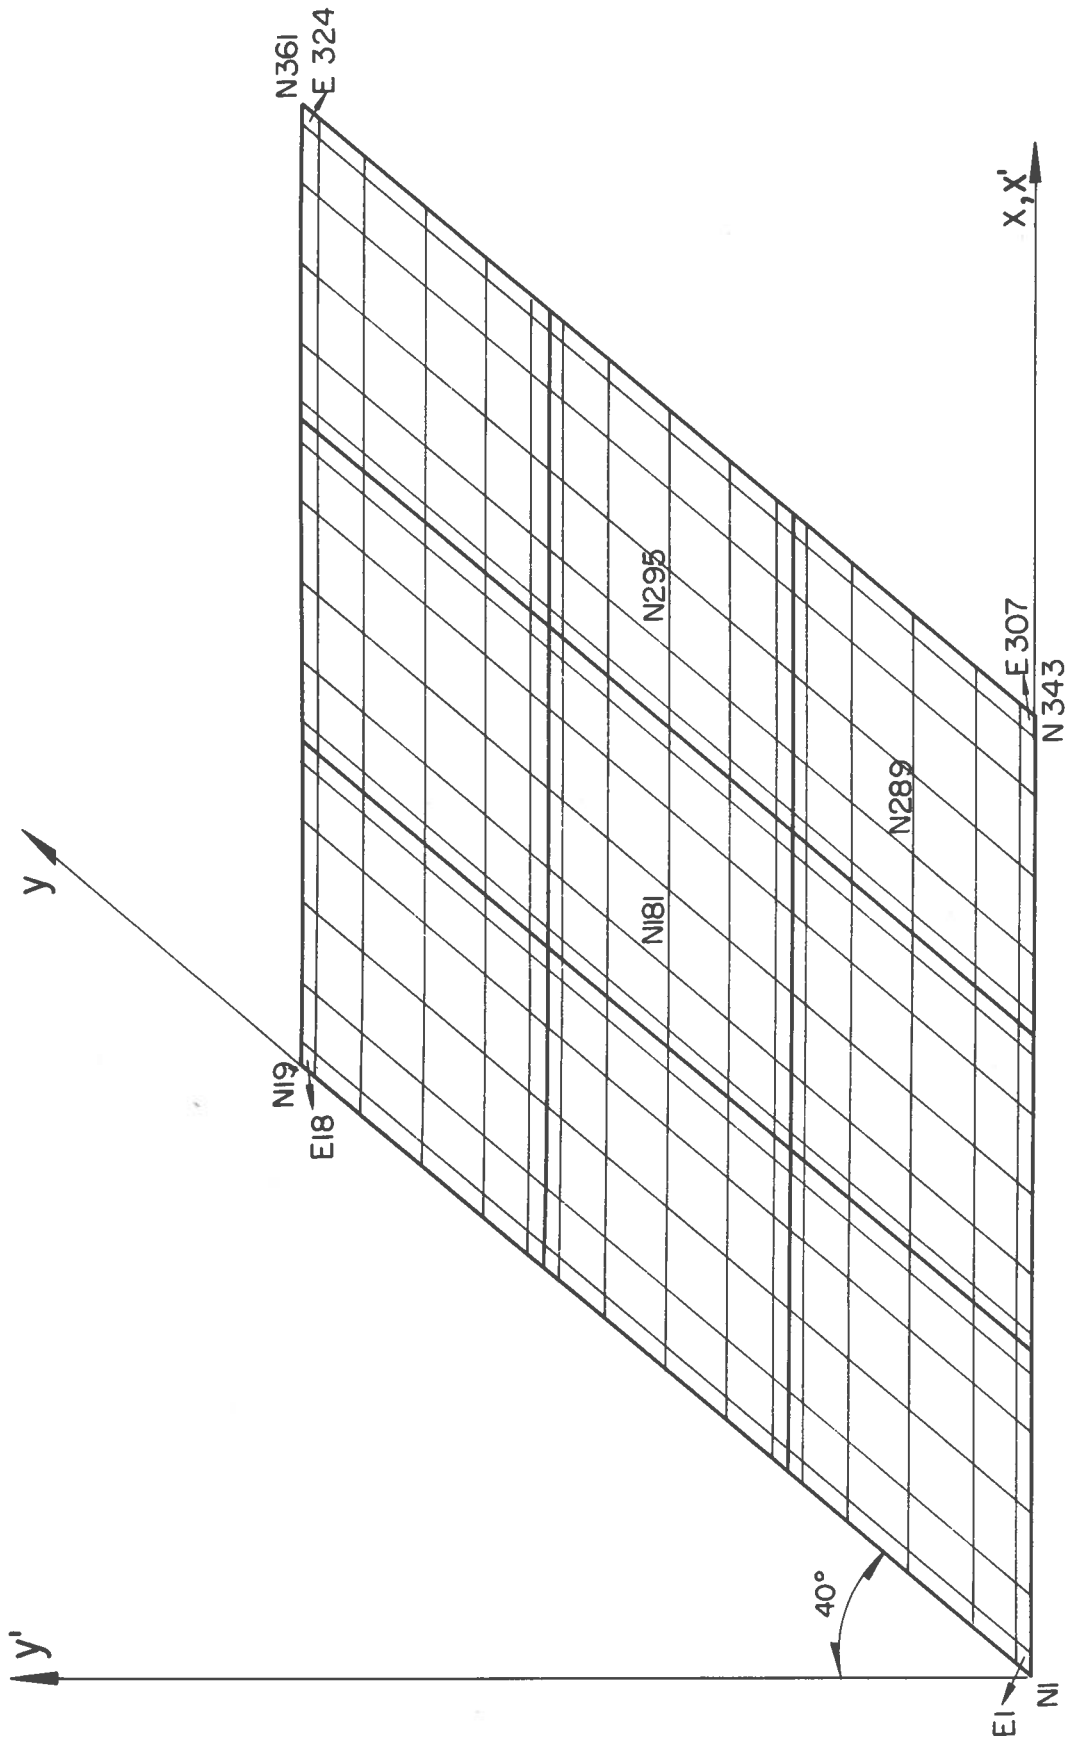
PLAN VIEW OF DECK SLAB PANELS
